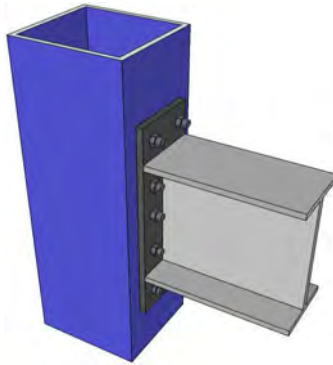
Connection of H-shaped beam to RHS column using end-plate blind bolts
